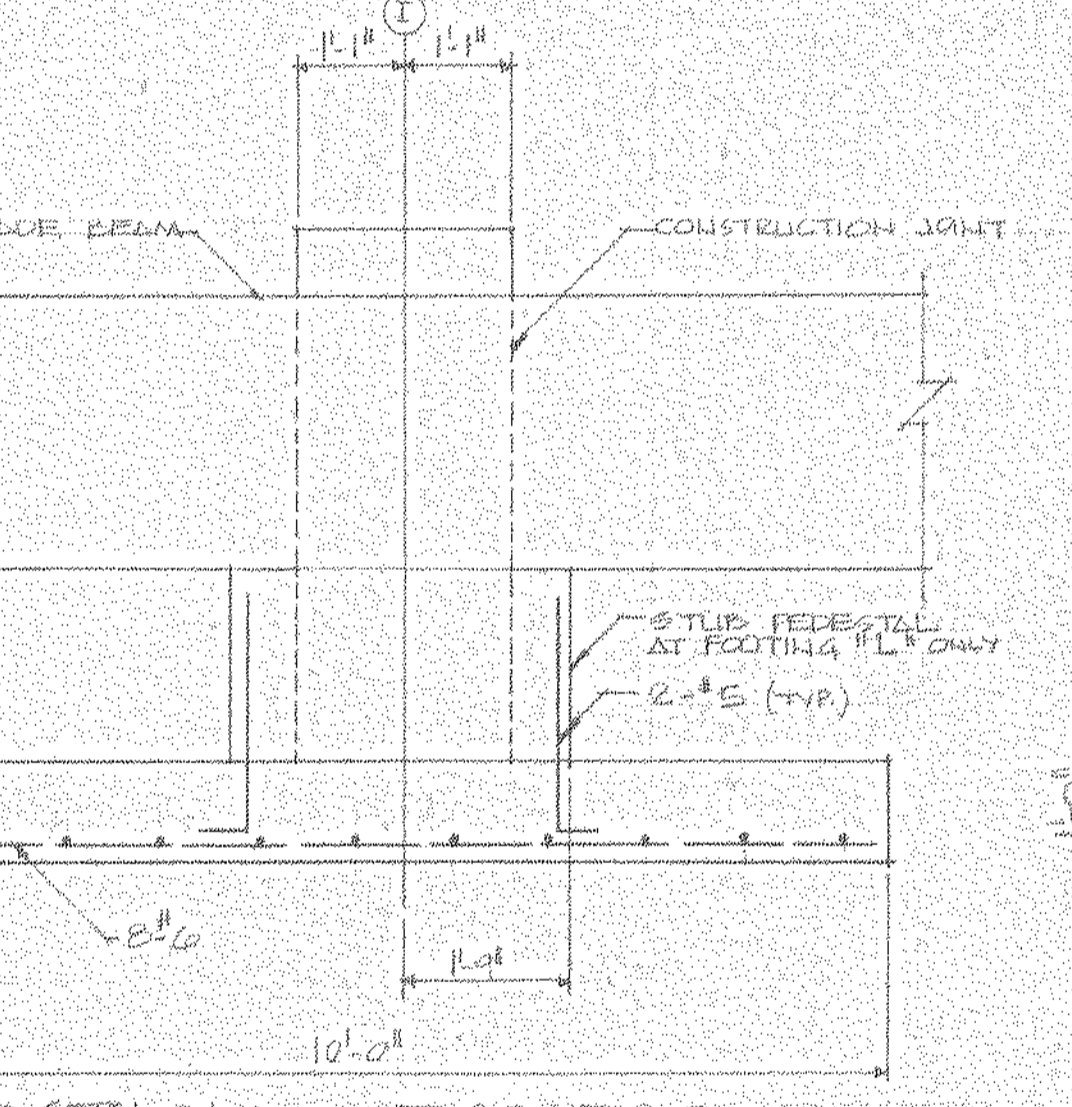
SCALE 1/2" = 1'-0" FOOTING "Q"
